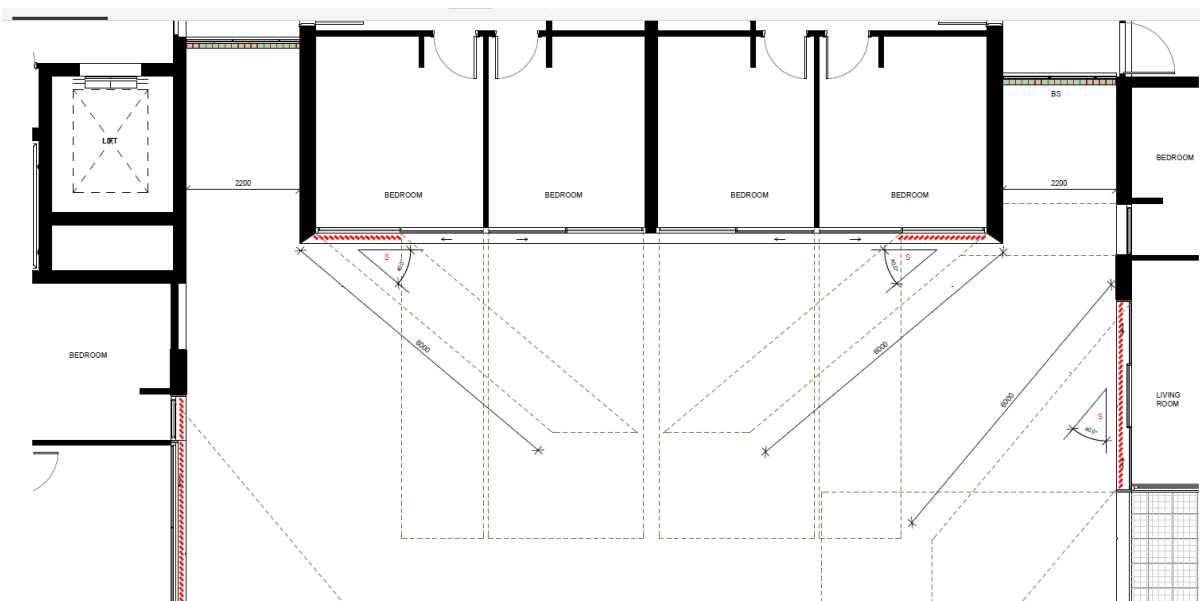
Vertical louvres are proposed on windows facing the internal courtyard
